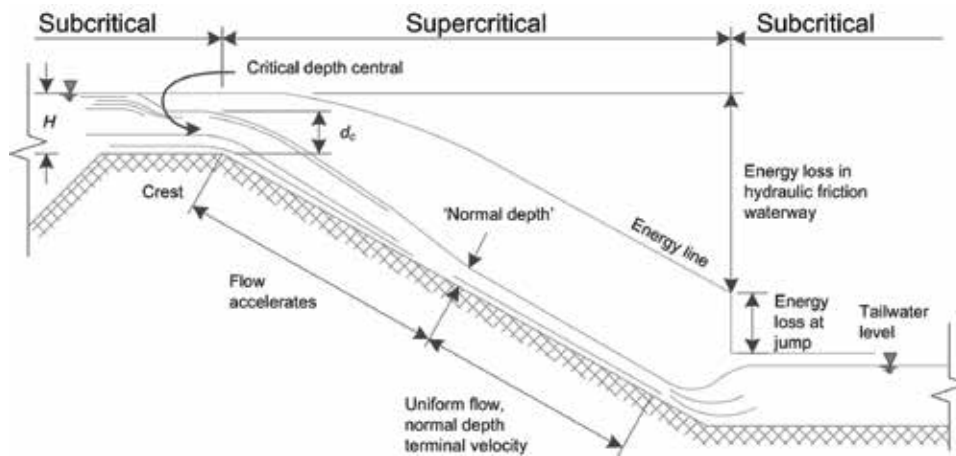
Elevation showing flow states down face of levee or spillway due to overflow (Hewlett et al, 1987)
